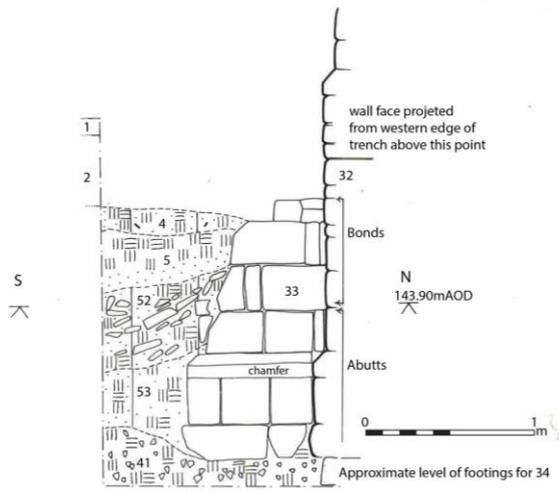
Elevation of original butters (33) attached to southern terrace wall (32)
